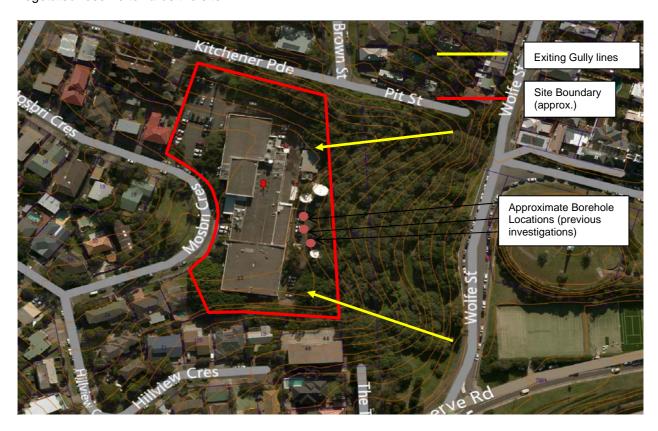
Elevation contours (2 m) at Mosbri Street Site Location
